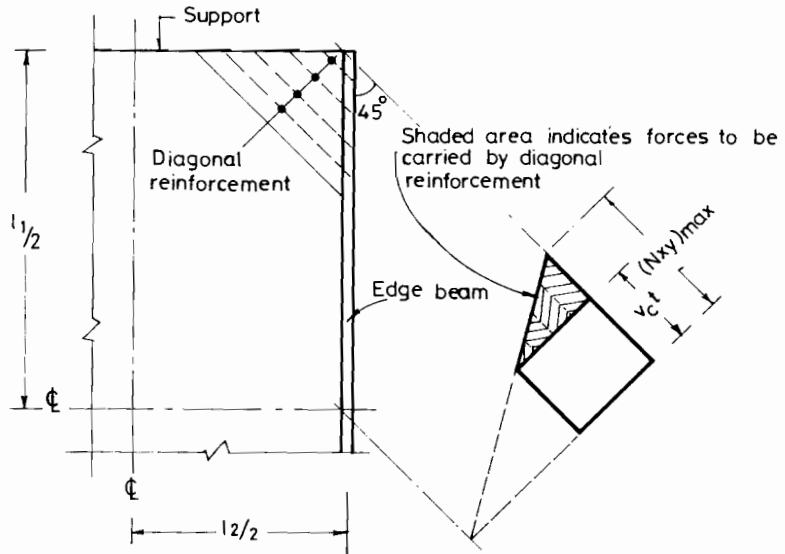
Developed plan of shell diagonal tension reinforcement.
